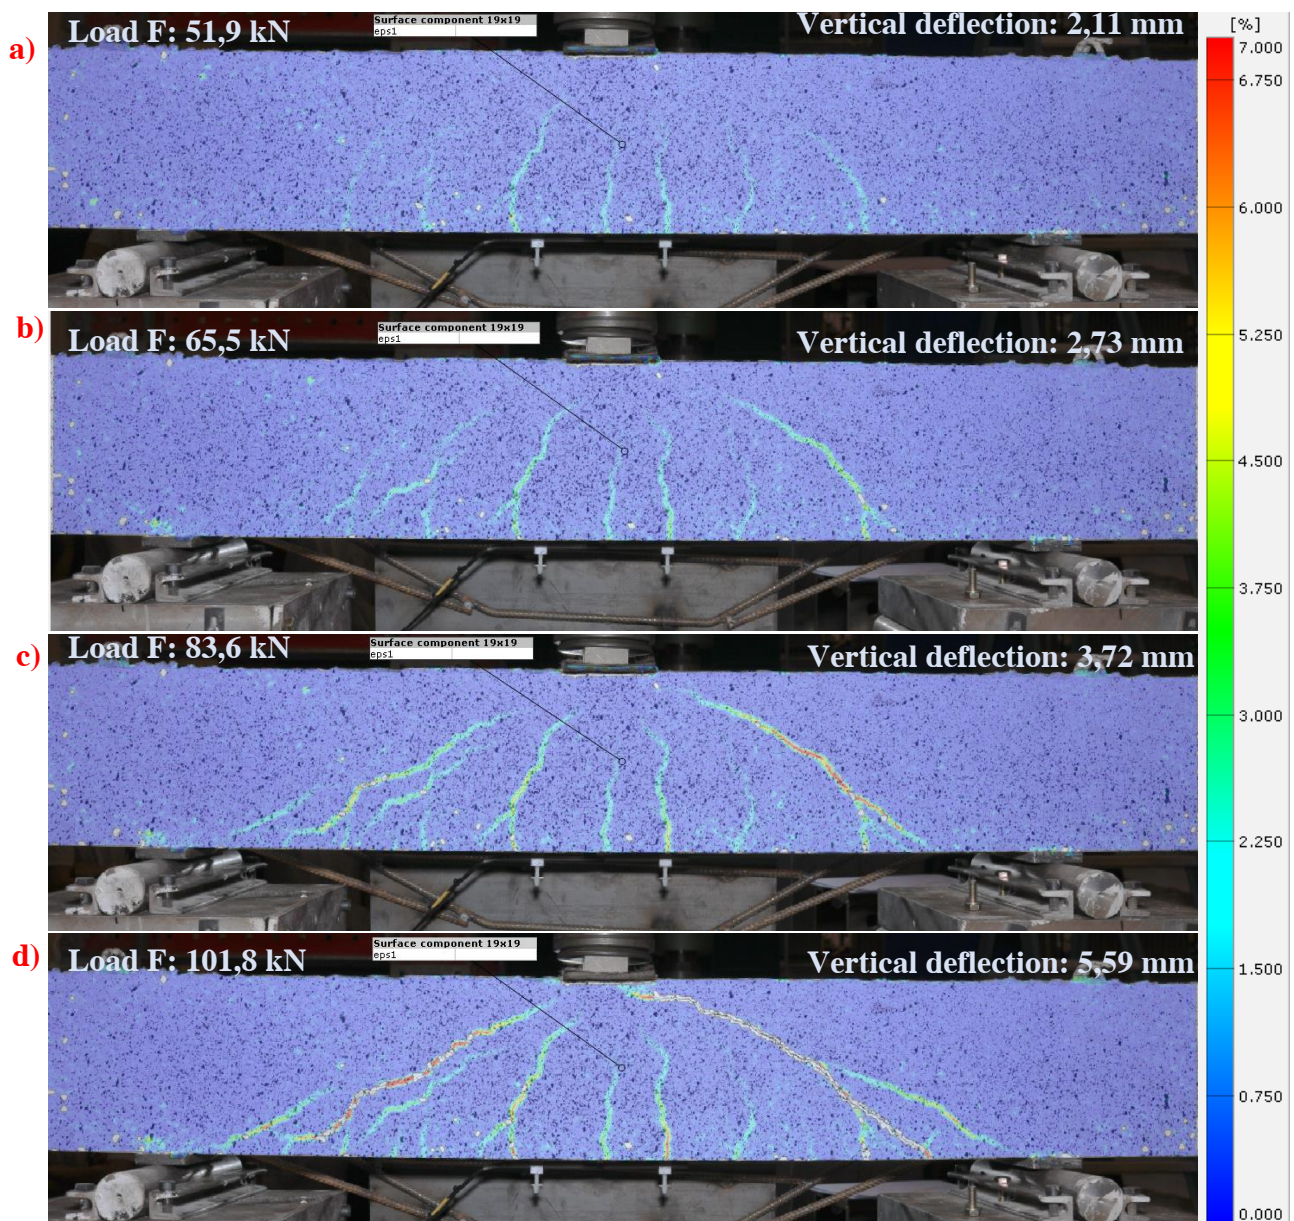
Crack pattern evolution in reference beam with shear reinforcement: major principle strain fields at various loading stages [front view]. a) full flexural crack pattern. b) inclination of cracks. c) formation of failure crack. d) the maximal load.
